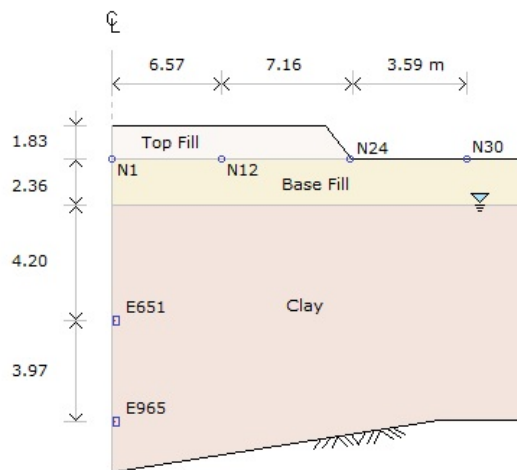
shows schematic embankment section view and material properties. Embankment construction consists of pervious base and top fills. These fills were placed on saturated clay deposit at constant construction rate of 2.62 Cm/day.
